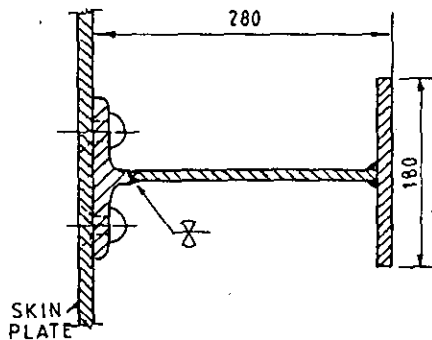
Replacement webs and flanges of vertical stiffener beams
